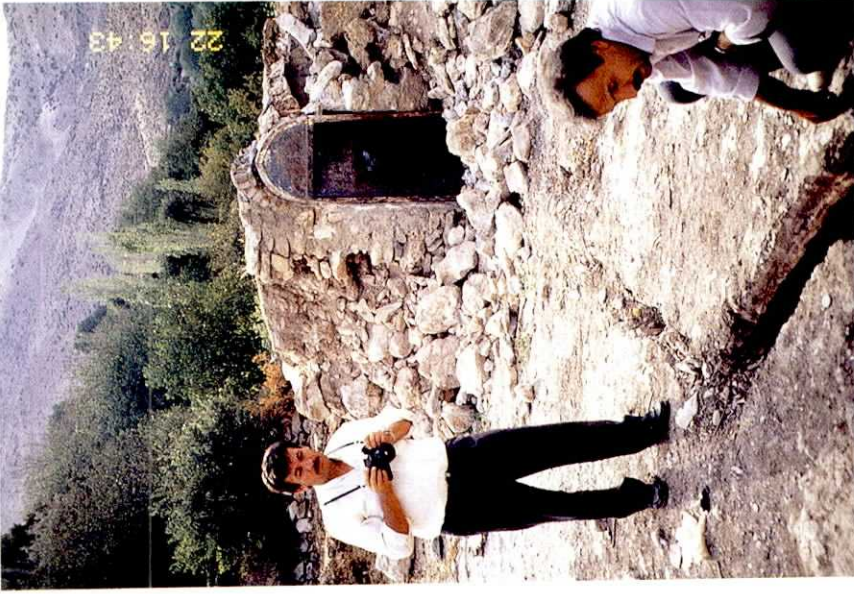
Surface crack at the end of the Village of Pakdeh on the hill side (Site No. 4 in Fig. 8).
